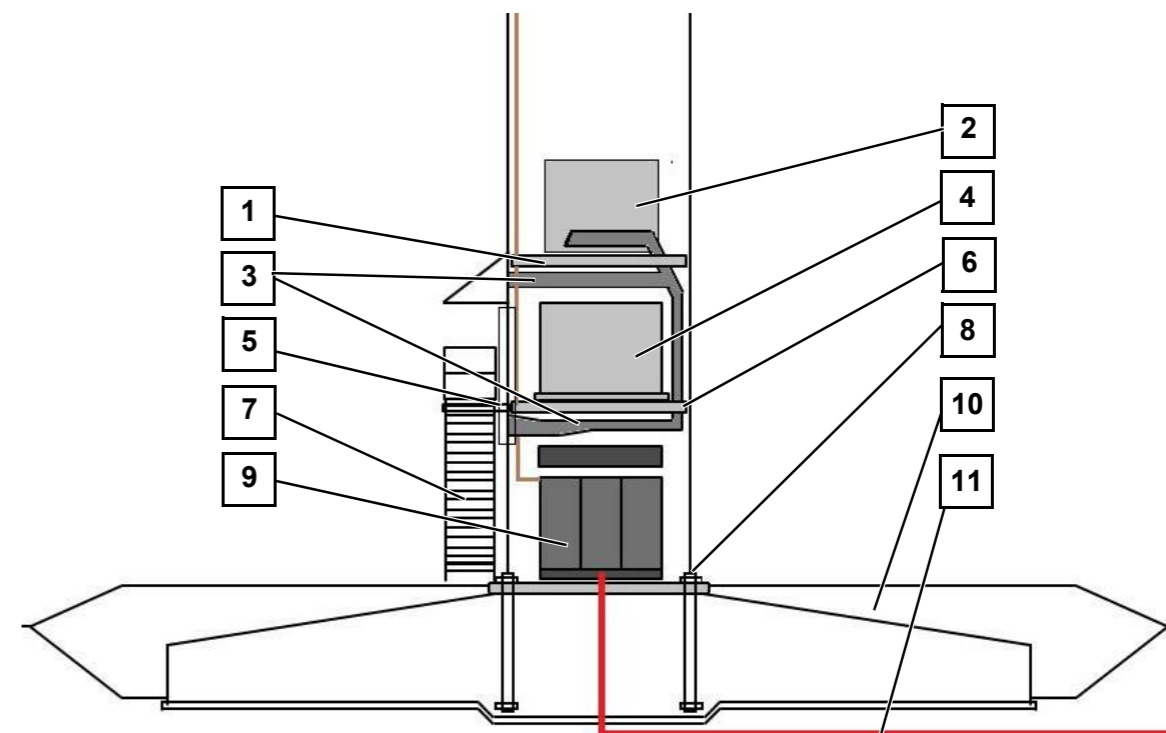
Sectional view of the tower base, variant with transformer inside tower (TIT)
